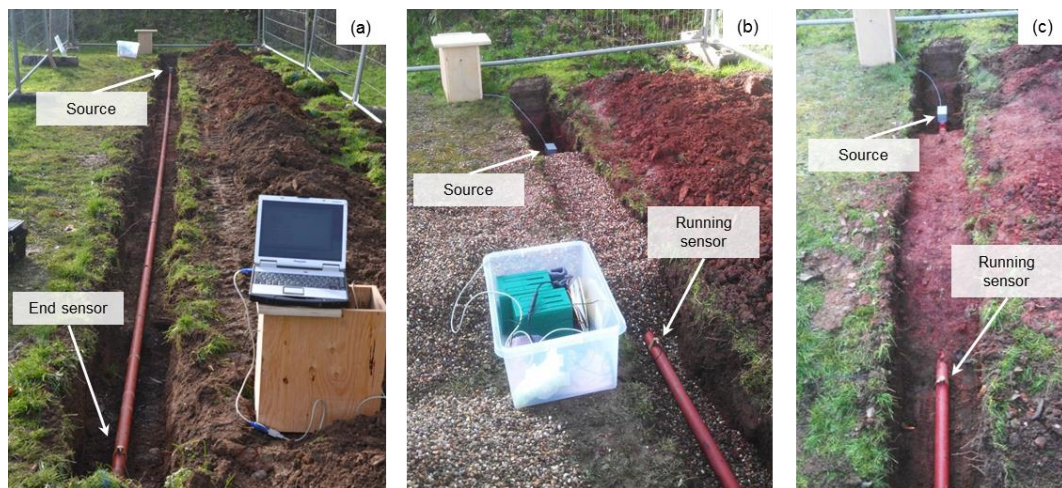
Photographs of trench experiment, a) pipe placed at the base of the trench, b) pipe placed on river gravel bed and backfilled with river gravel, c) pipe placed on clay bed and backfilled with clay
